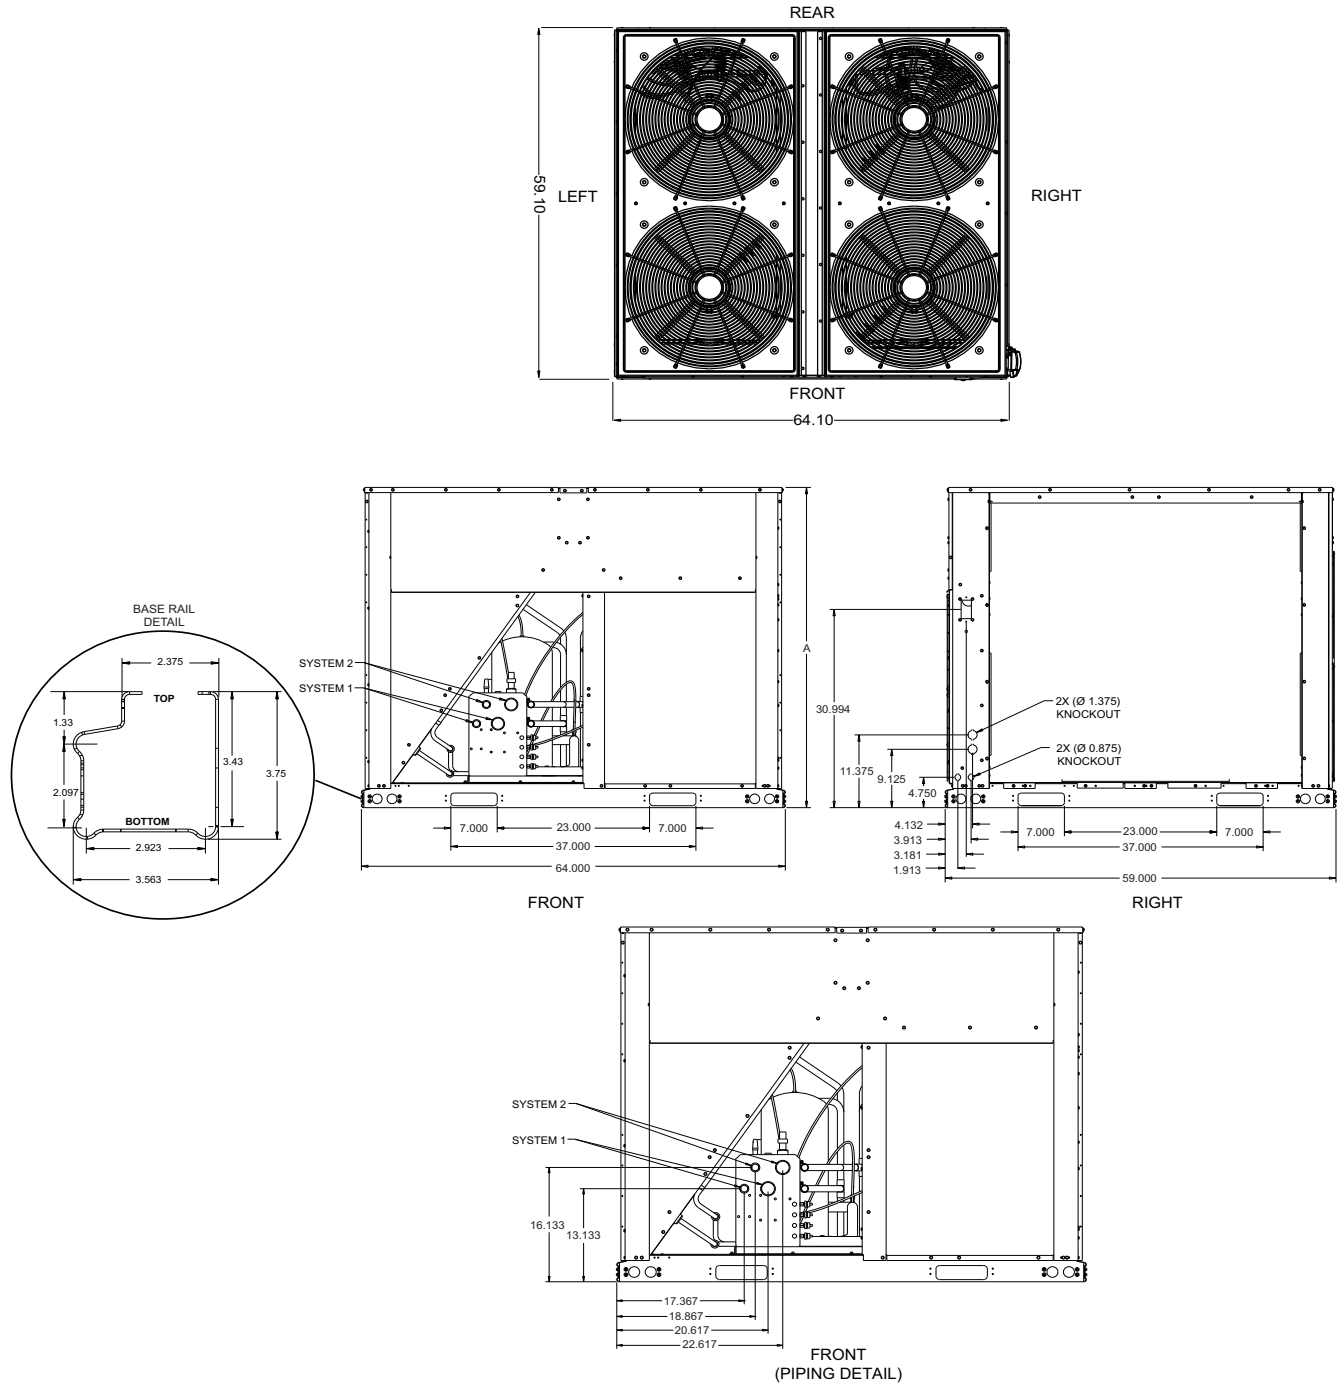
PC/PD180 & PD240 Unit Dimensions and Piping & Electrical Dimensions
